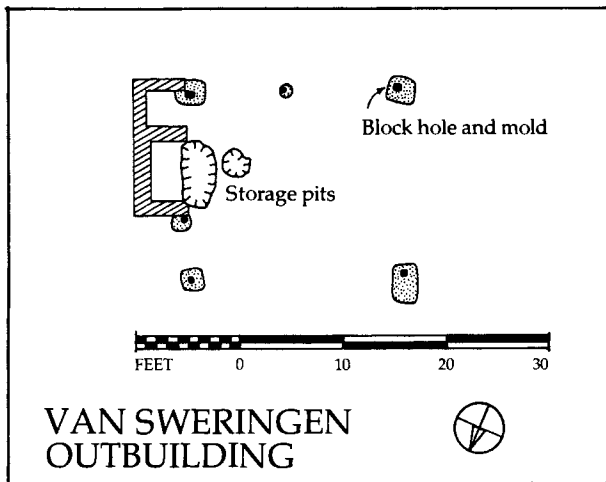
An outbuilding, possibly a bakehouse and quarter, built by Gerret van Sweringen at St. Mary's City, Maryland. The silled frame was raised on hole-set blocks. (Drawing, Shearon Vaughn.)
